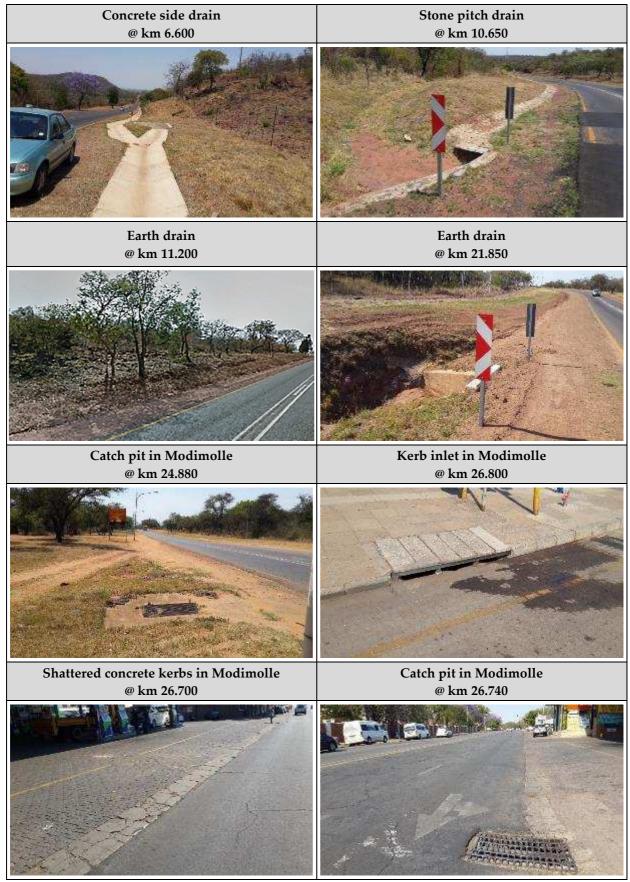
Road side drains (concrete, stone pitching and earth drains)
